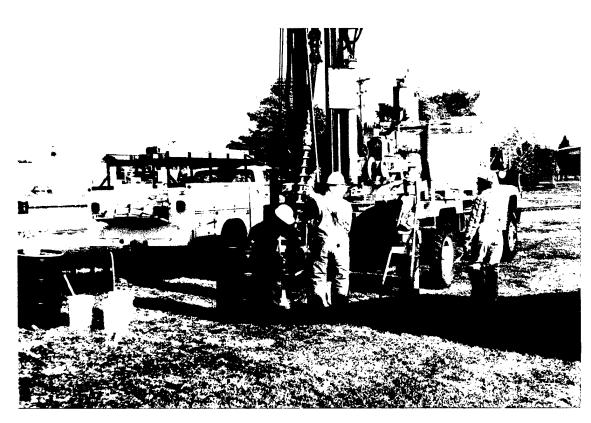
SPT, Split-Spoon-Sampling and Lithology Logging at Sparge Well Drilling, Site SS-06
